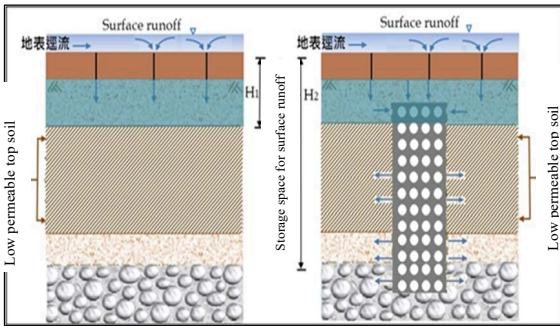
Conceptual sketch of installing a vertical infiltration pipe
